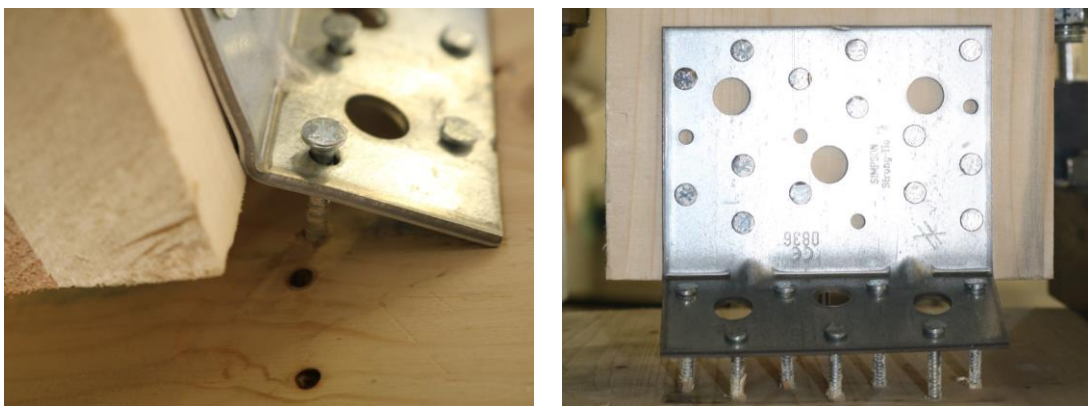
Failure of the angle brackets under tension loads fixed to CLT support.
